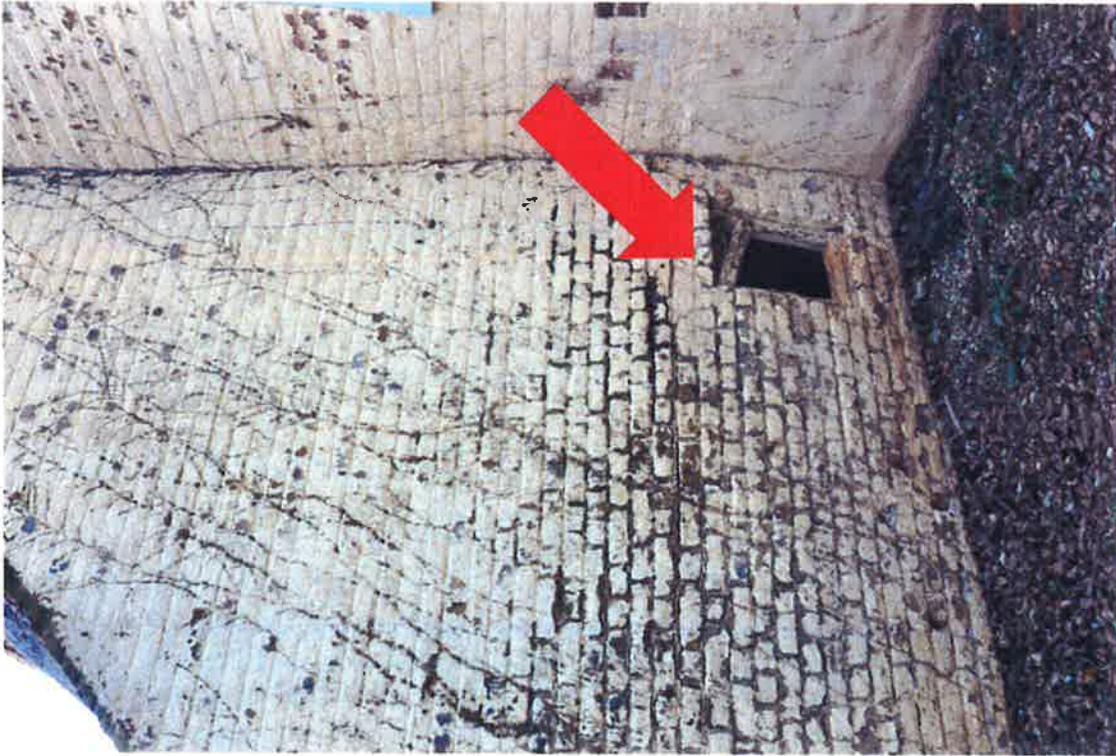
East wall of buttress. Arrow points to deflection and failing brick above the window opening.
